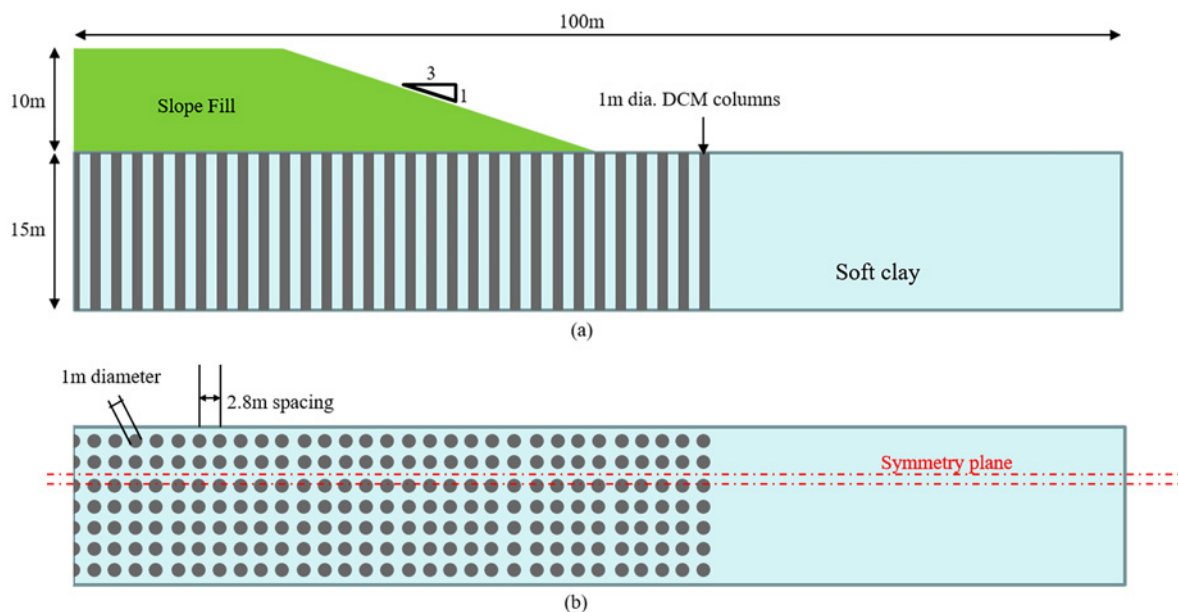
Geometry of the embankment: (a) Elevation view; (b) Plan view
